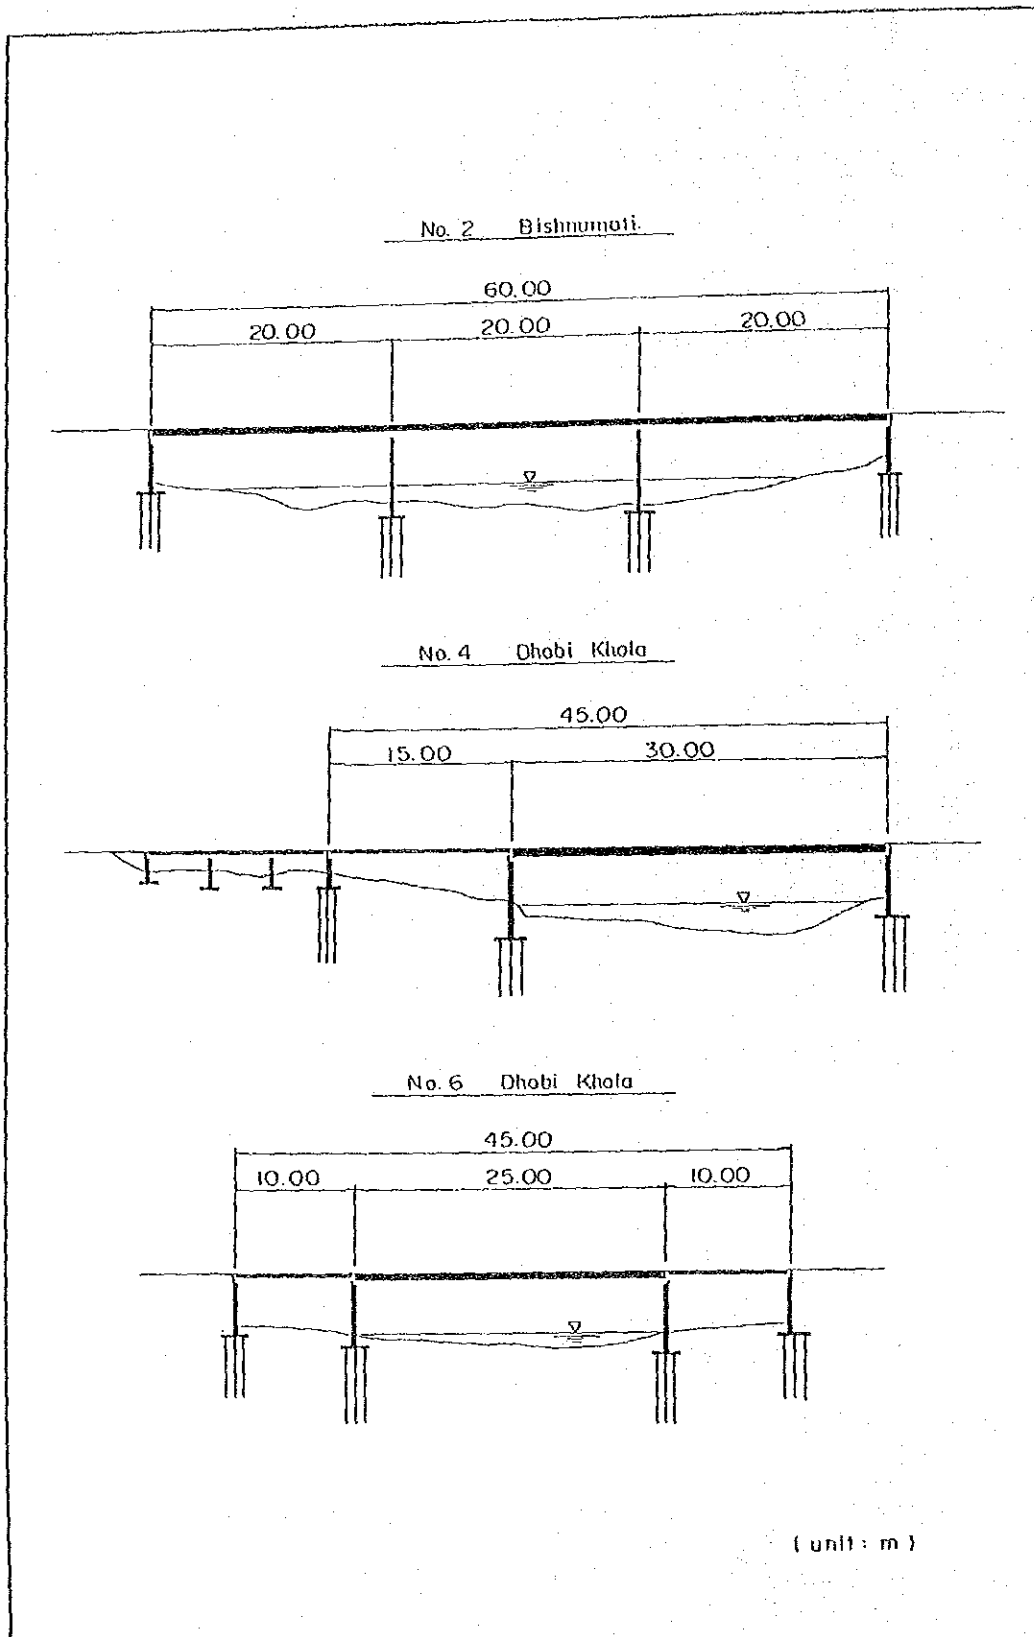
SPAN ARRANGEMENT OF PLANNED BRIDGE
